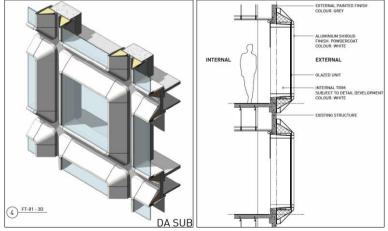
(left): 3D close up of proposed window shrouds and glazing
